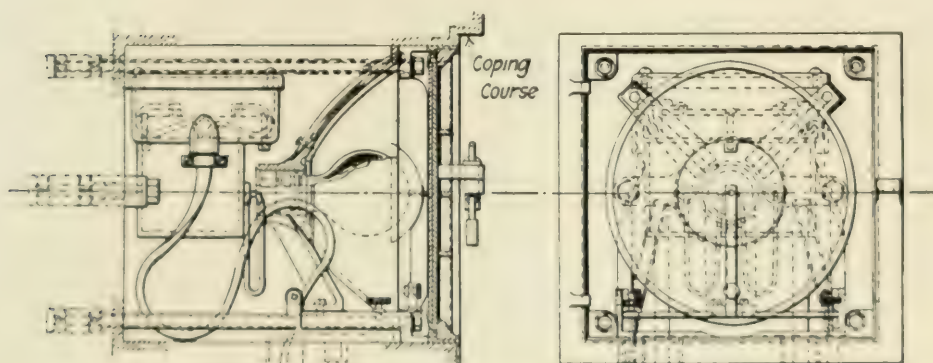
A.—Section and plan view of lighting unit used on roadway showing details of construction.
